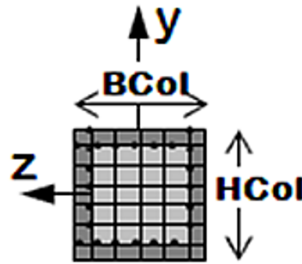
Fiber section diagram for reinforced concrete members (from OpenSees Example Manual)
